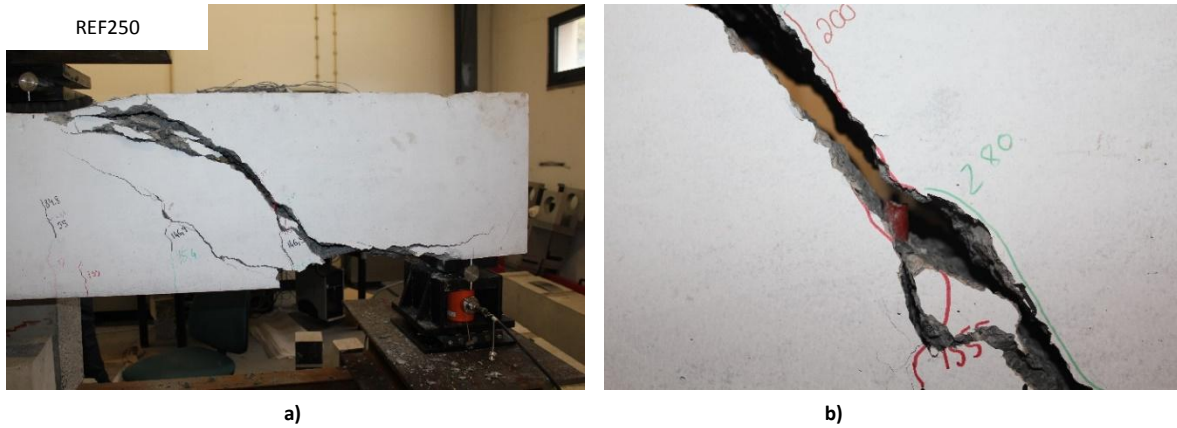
REF250 beam failure: a) front view of the support; b) broken stirrup
